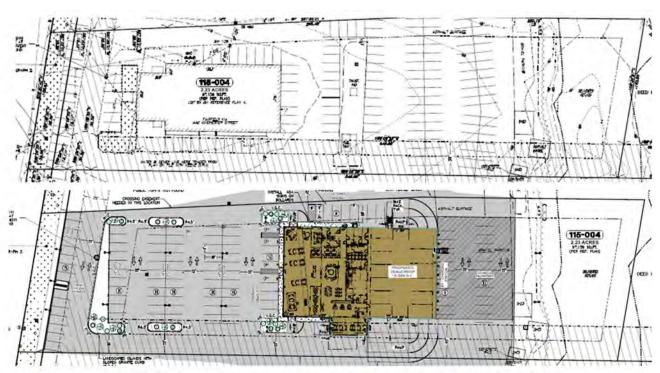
(Top) A snippet of the existing conditions plan for the Kia site. Figure 3. (Bottom) A snippet of the proposed conditions plan for the Kia site.
